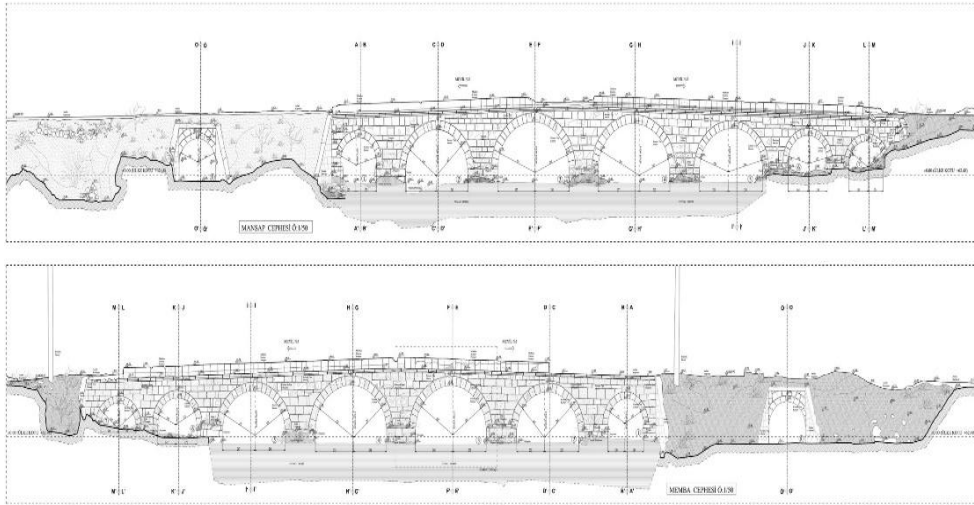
Façade drawings of Büyükkarşıtıran Bridge (Ayberkin, 2018).
